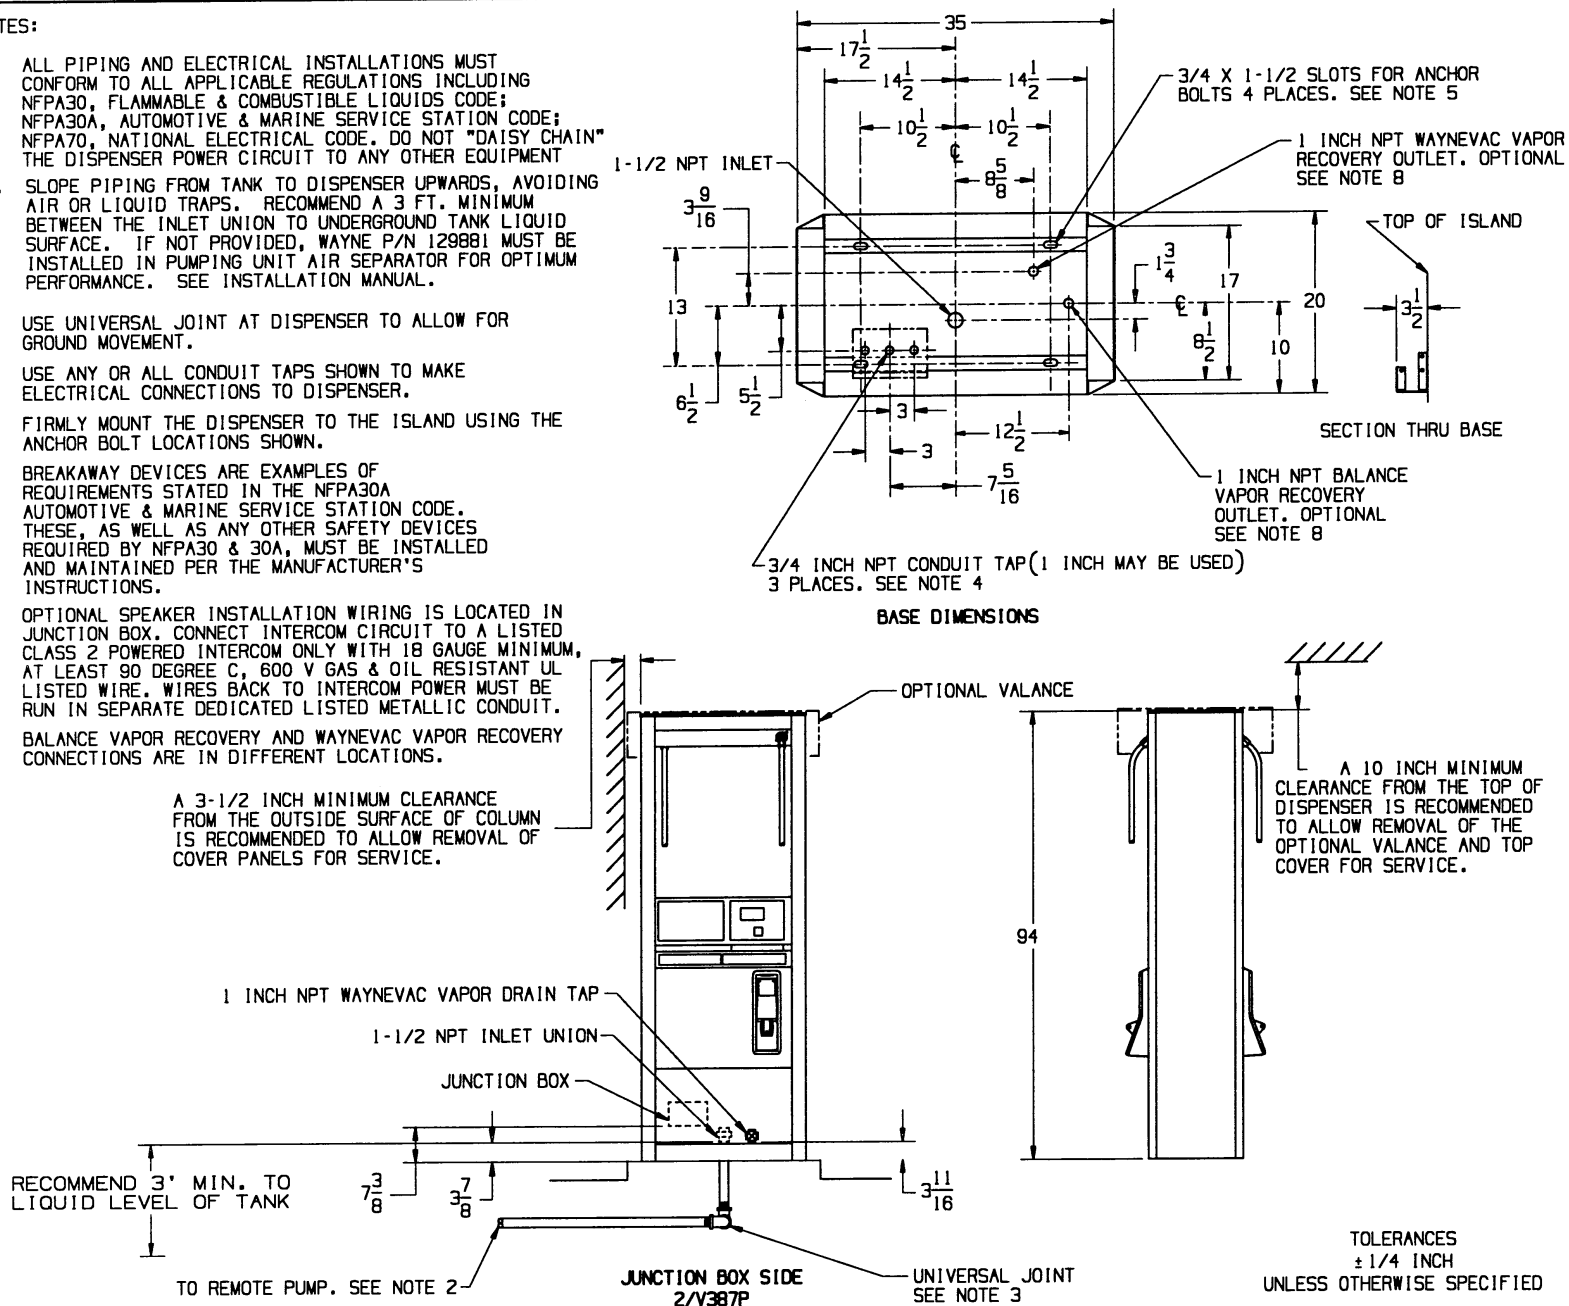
13-7193-C Installation Instructions - 3/V387P (Suction)
